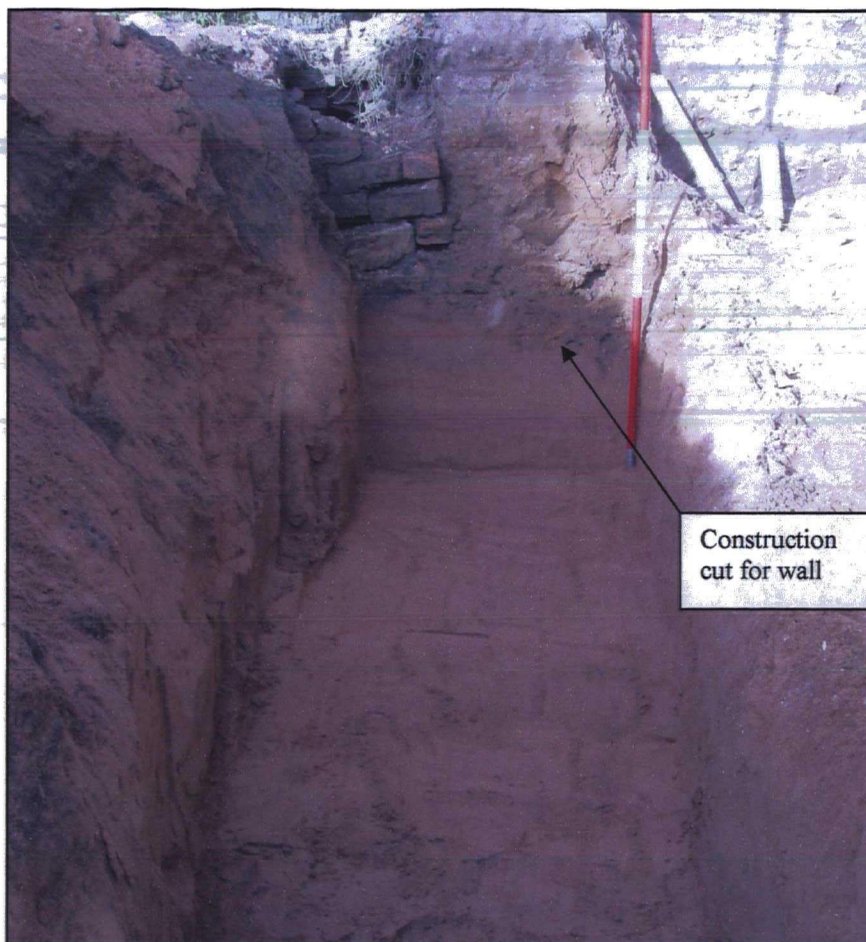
The excavated foundation trench, looking west, scale 2m pole.
